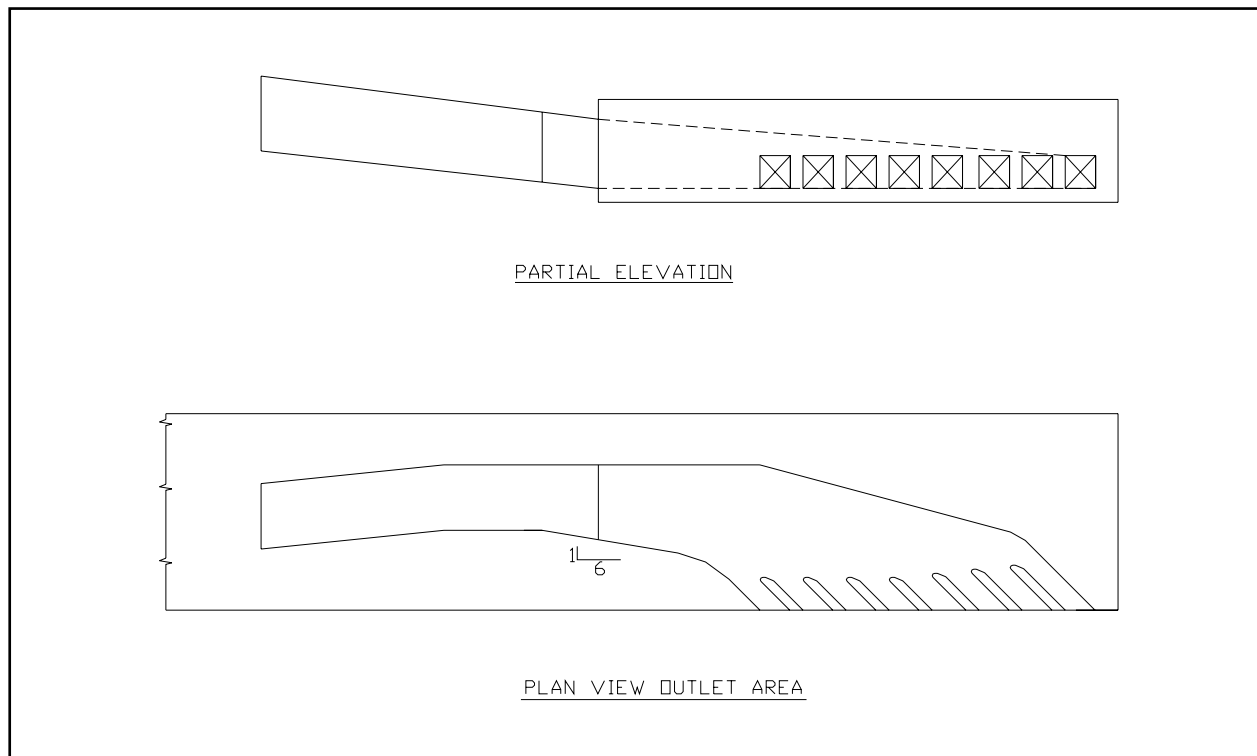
Type 2 Outlet Design for J. T. Myers lock extension
